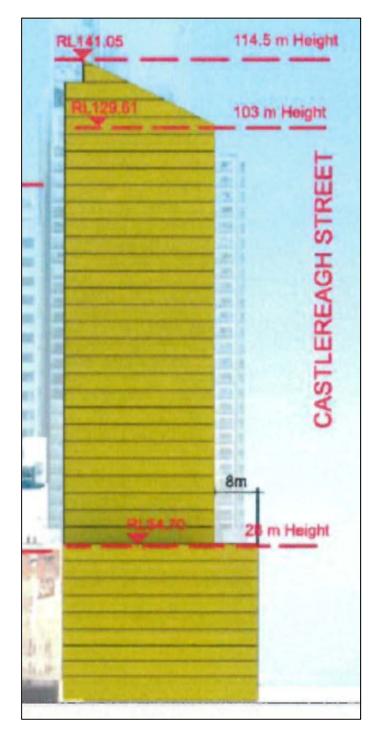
The approved Stage 1 building envelope, illustrating the approved roof form and slope
